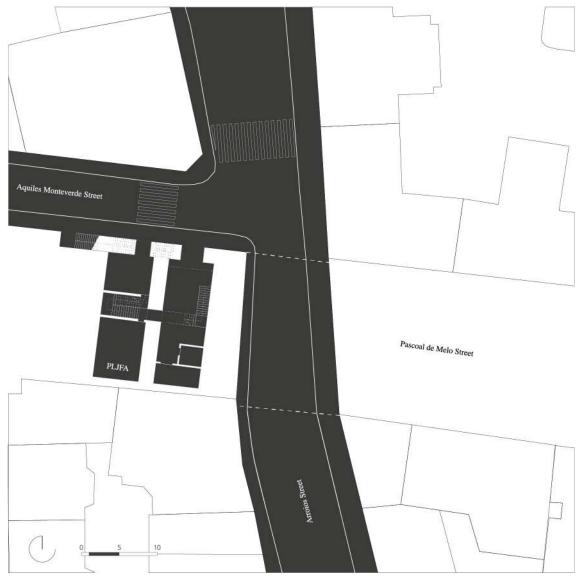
Plan of PLJFA, located on the intersection of Aquiles Monteverde and Arroios streets, underneath Pascoal de Melo street – Source: Author 2022
